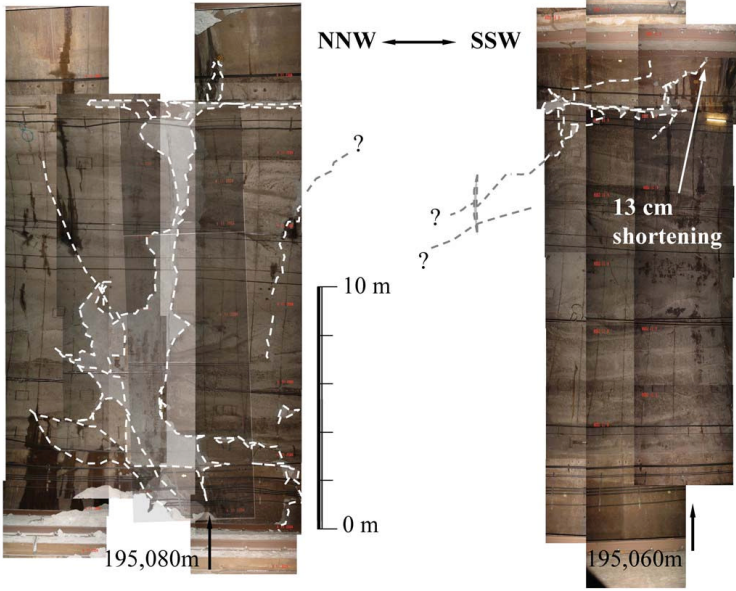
Lining crack development of Uonuma tunnel. White dashed lines indicates crack location and shaded areas show spalling.
